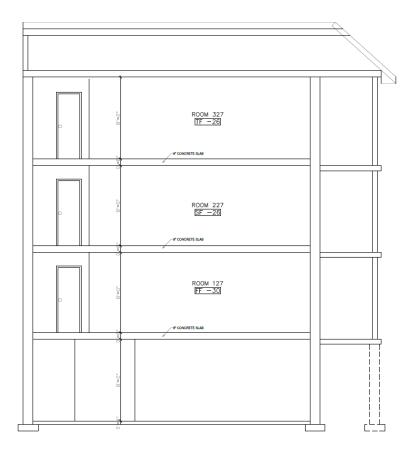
Cross section - West façade (Benan Hanoudi Architect)
